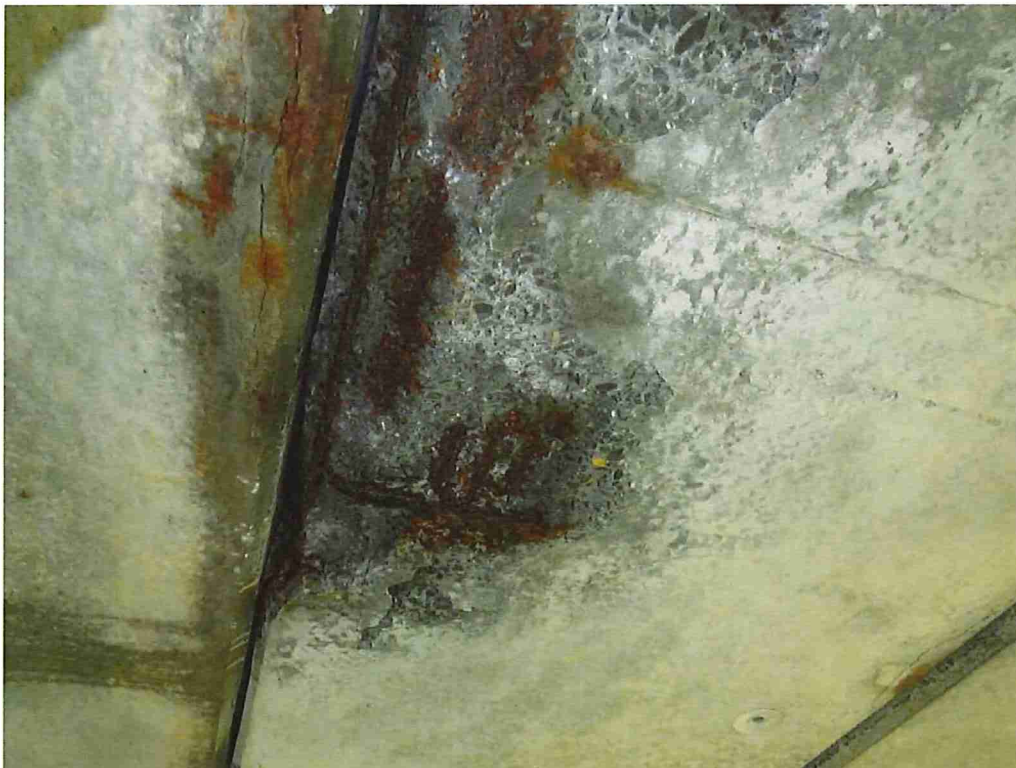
Exposed tendons in beam 7 at 24' from the west abutment.
